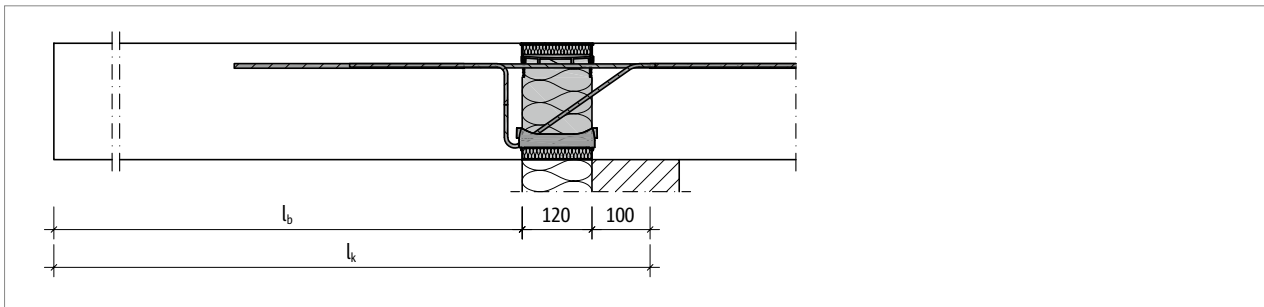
Schöck Isokorb® XT type K: System cantilever length ( $l_k$ ) for design and geometric cantilever ( $l_b$ )
